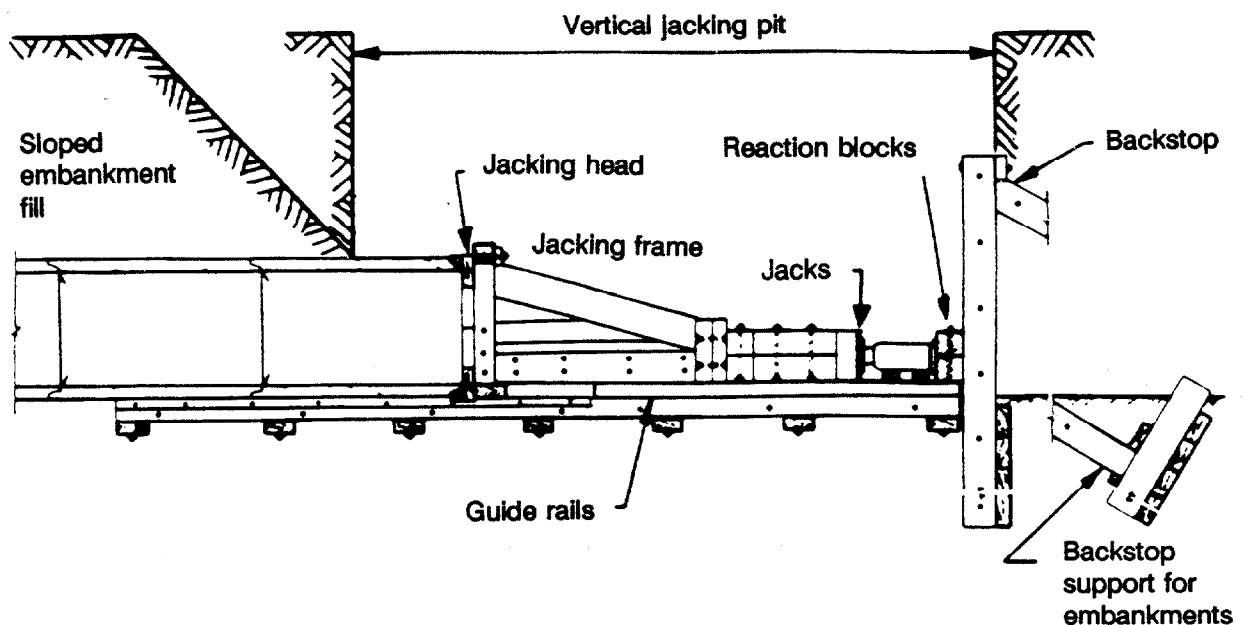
Typical jacking installation.<sup>(4)</sup>
